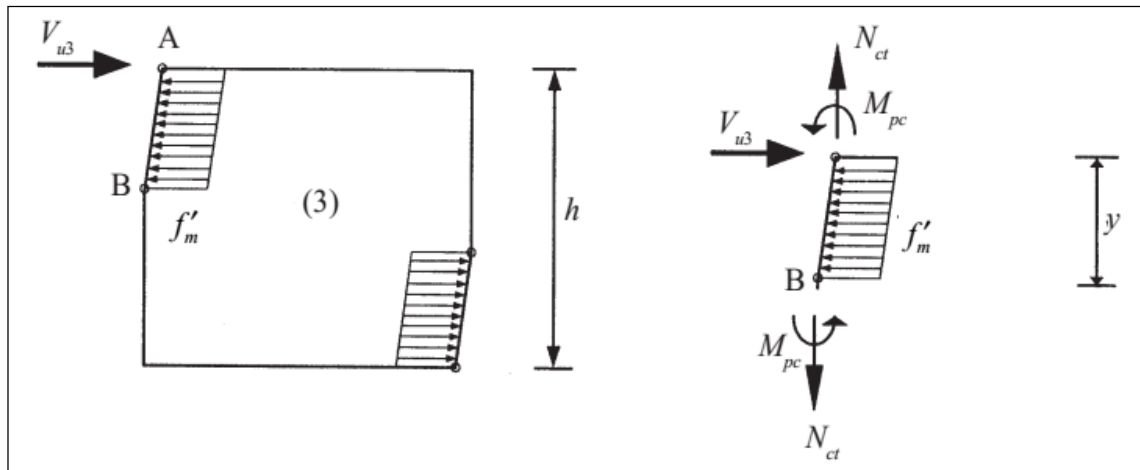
Failure mechanism 3 (Mehrabi & Shing, *Seismic Analysis of Masonry-Infilled Reinforced Concrete Frames*, 2003)
